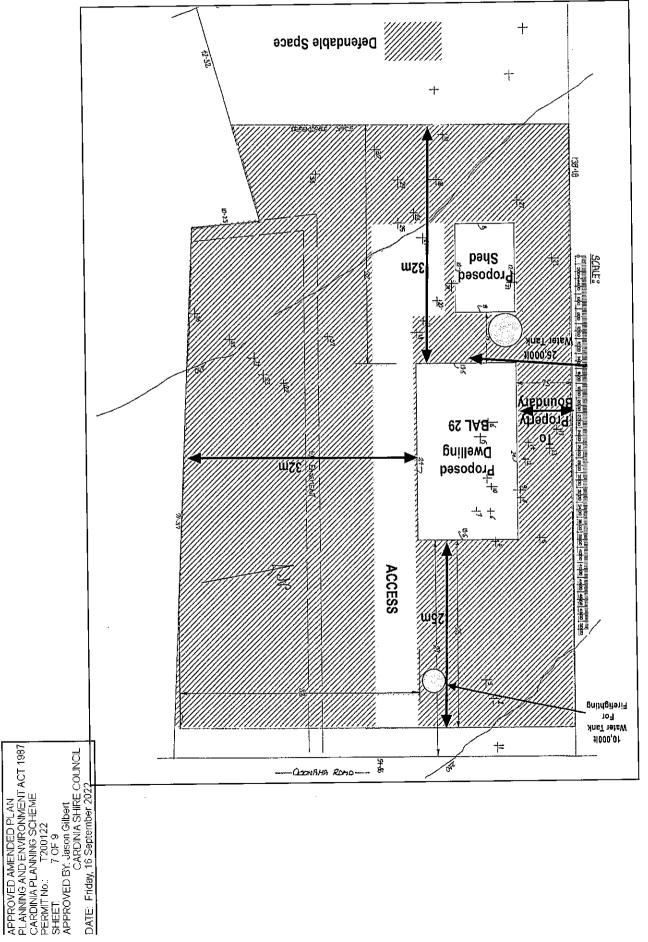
BMO requirements for 8 Doonaha Road, Cockatoo. Defendable Space shown hashed, water tank, BAL rating, and access.
